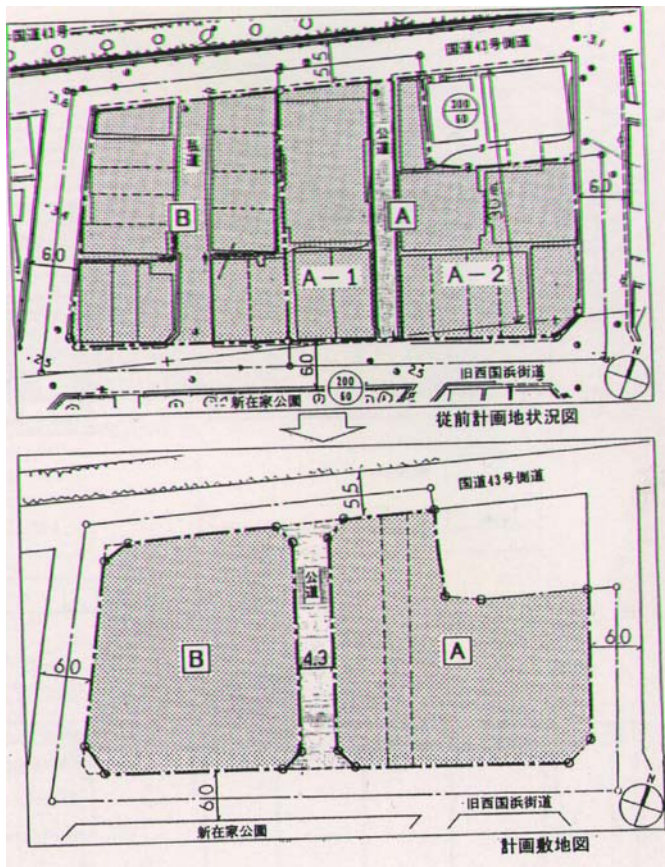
Casa Bella Site, Before and After Joint Housing Construction
